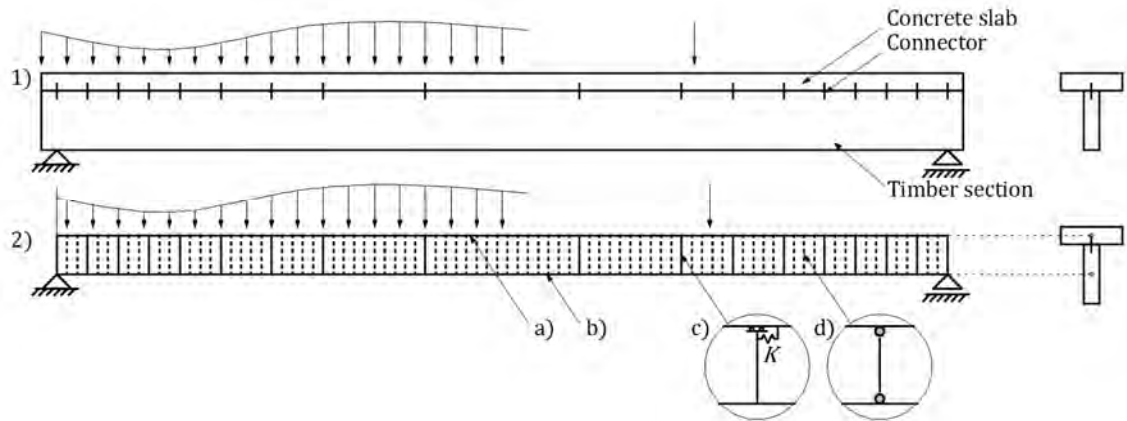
FE modelling scheme of TCC beam parts: a) concrete beam, b) timber beam, c) flexible connection member and d) rigid separation link
